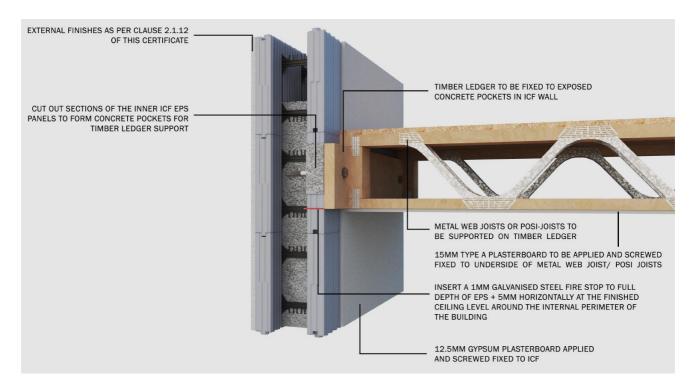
Floor Detail - Floor Joists Perpendicular to Wall
